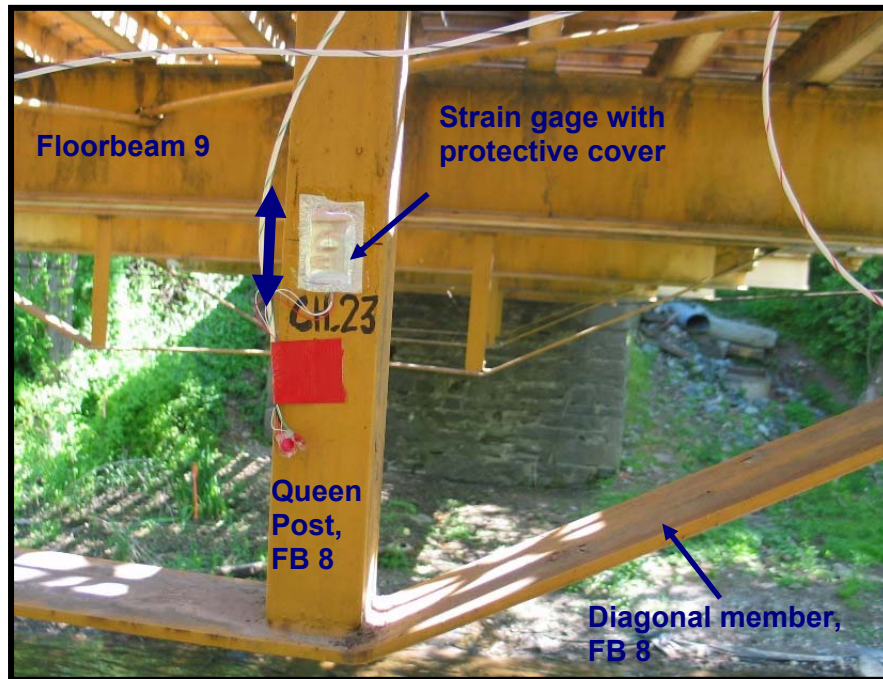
CH\_23 installed on the front face at mid height of the vertical strut attached to the bottom flange of floorbeam 8
